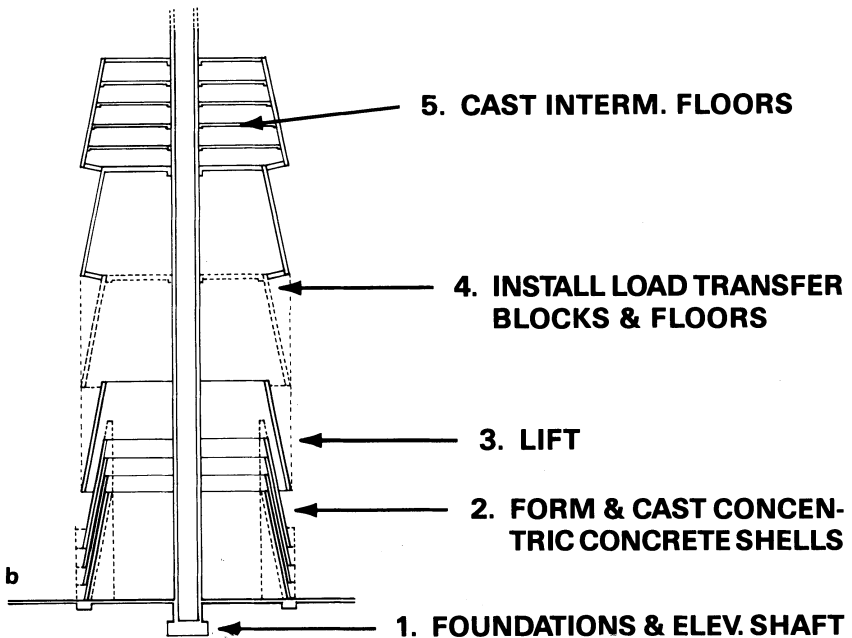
Various stages of construction of a tall prestressed concrete building.
